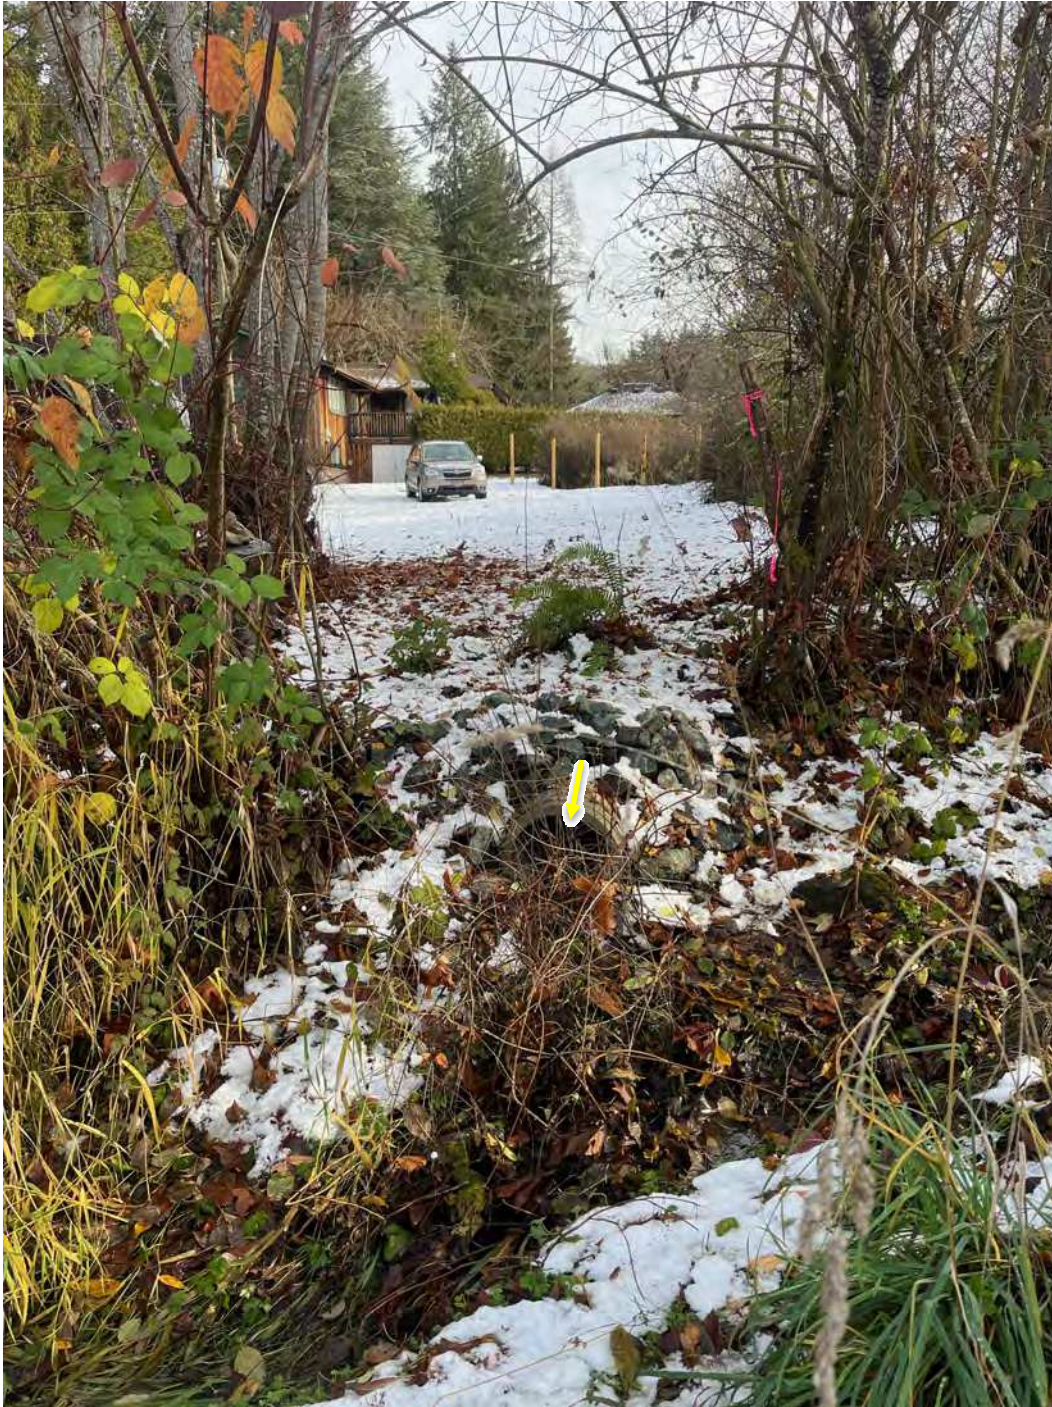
Looking southeast across the subject property along the alignment of the buried culvert on 1935 Maple Bay Road. Yellow arrow indicates the buried culvert outlet. The drainage ditch on 1949 Maple Bay Road (Figure 10) is in the foreground (Figure 10.).
